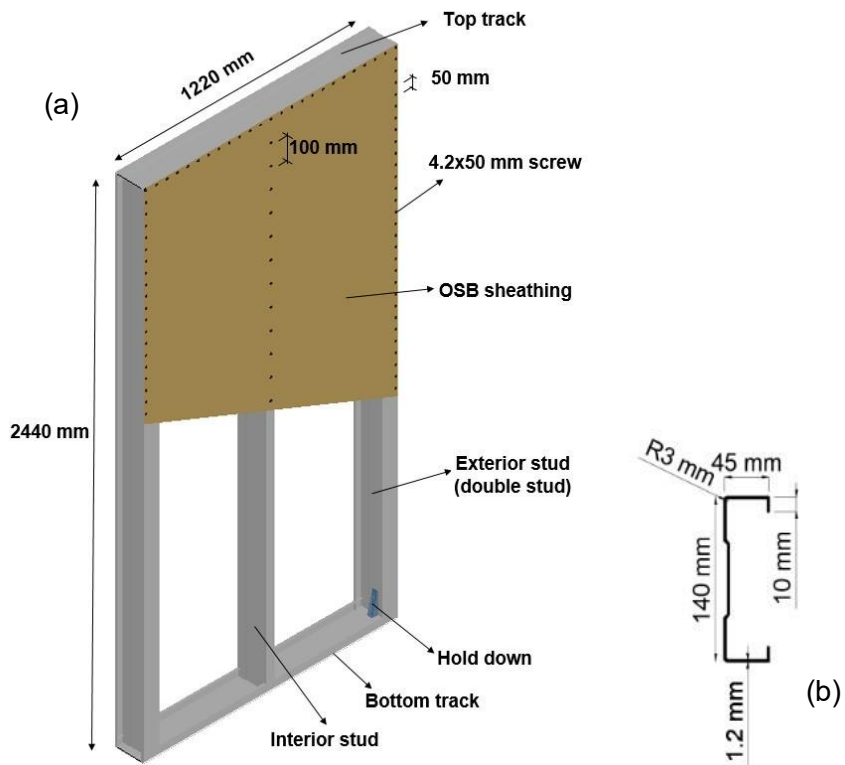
(a) Framing details of wall panels; (b) CFS section used in the study for tracks and studs
